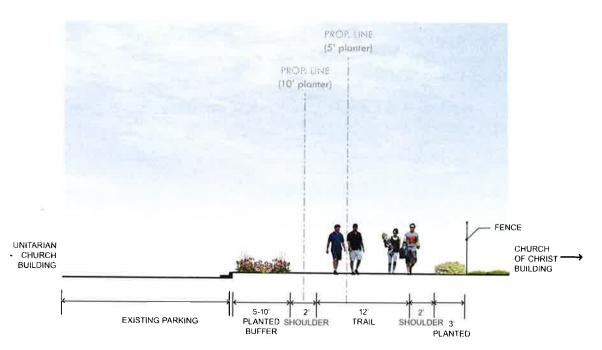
Option 3 – Full Build-Out North Typical Section
